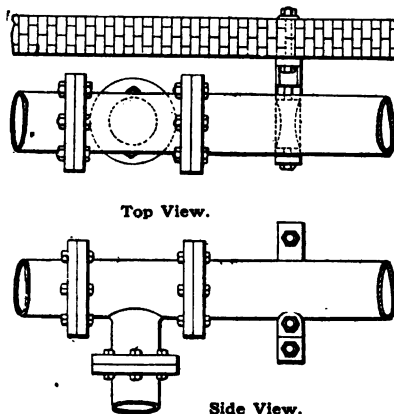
shows a main header carried in suitable frames fitted with adjustable rollers and anchored to the wall of a building.
